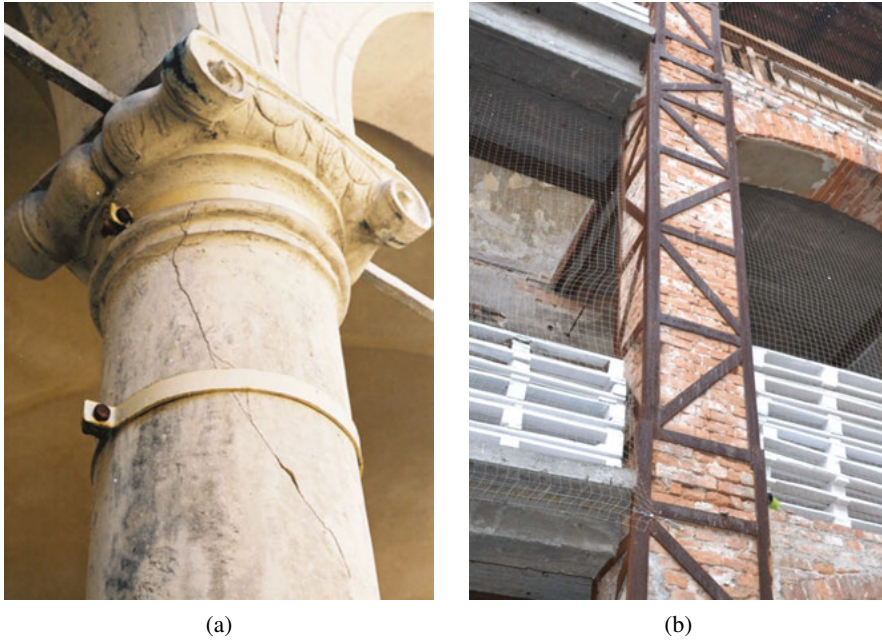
Traditional reinforcements of: a) stone columns (Castle of Baranów Sandomierski), b) brick masonry pillars (gallery of tenement house in Cracow, Gołębia street)
